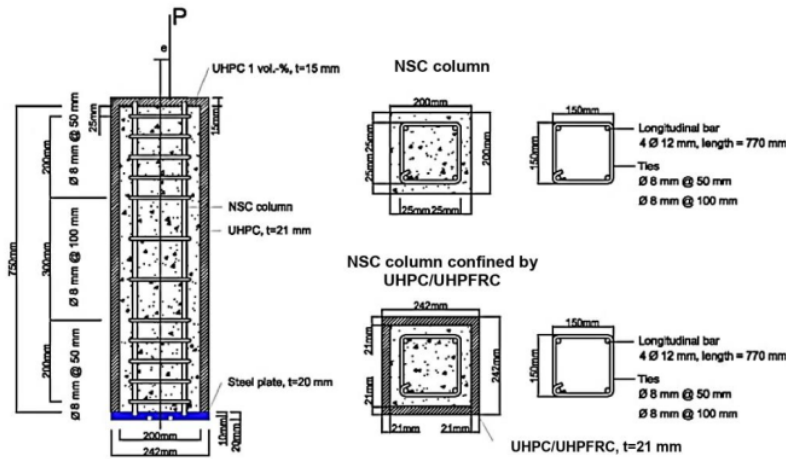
Geometry, dimension and cross-section of column specimens [17,19]
